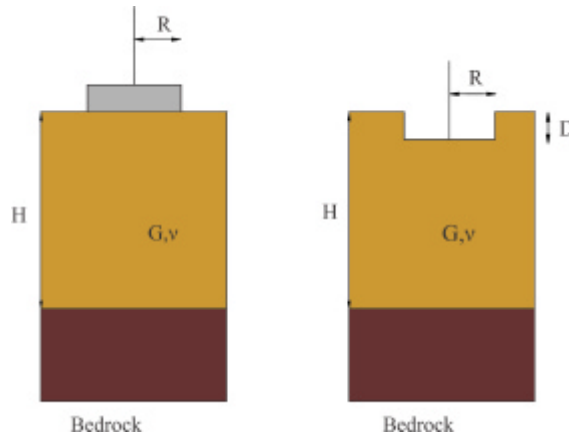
a. Circular footing on stratum over bedrock, b. circular footing embedded in stratum over bedrock
